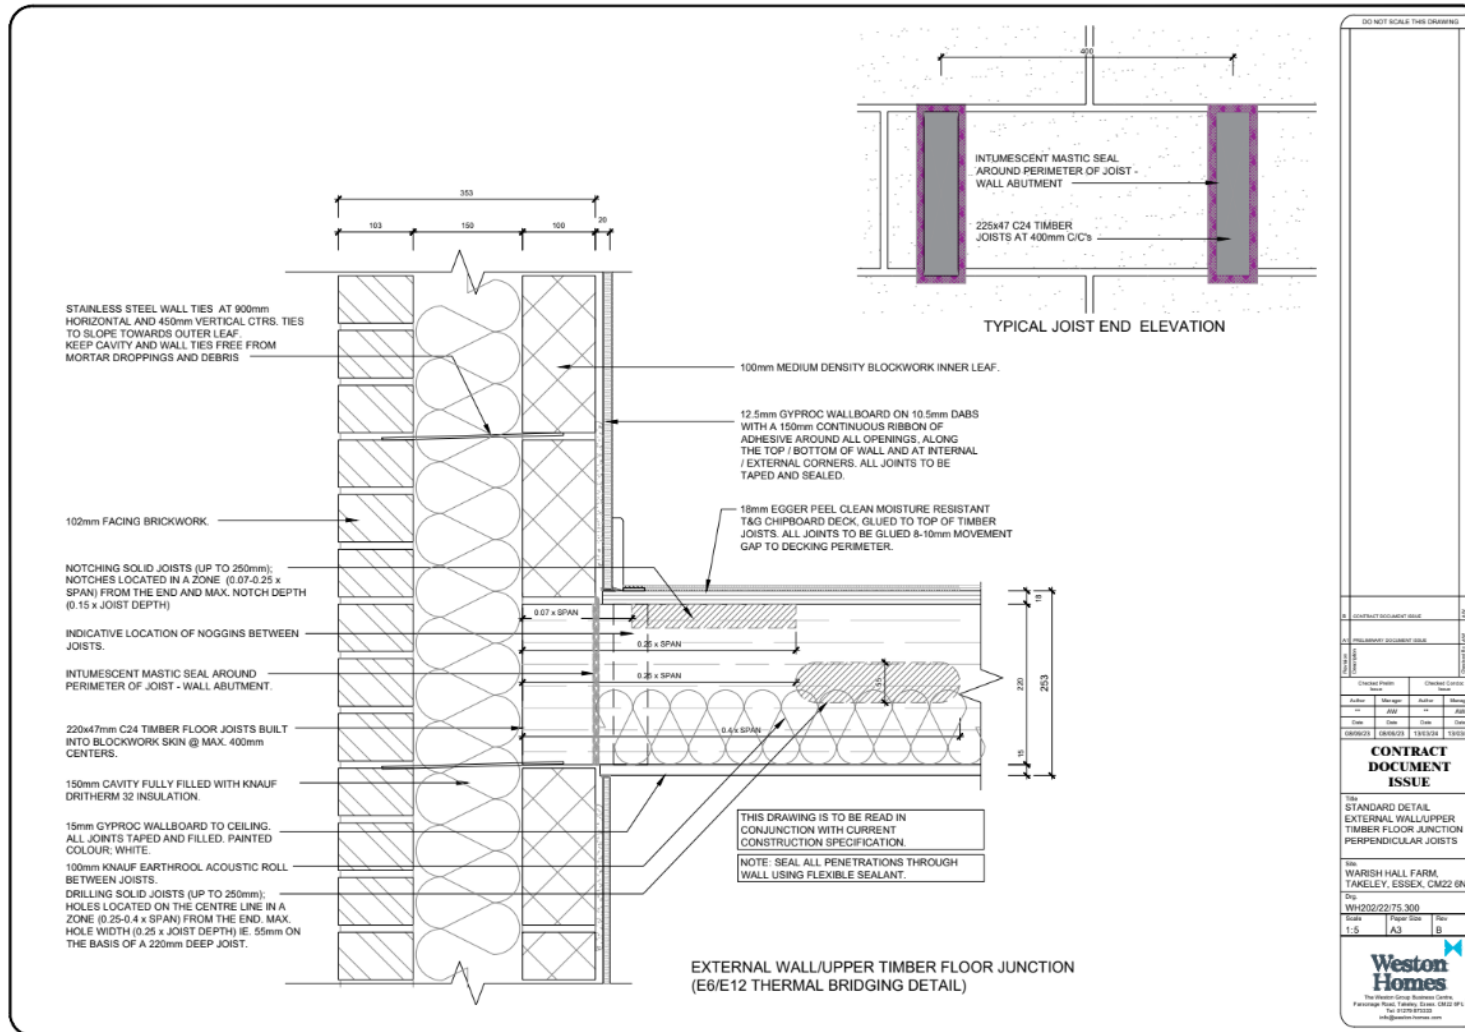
External Wall Construction Drawing WH202/22/75.300 – Jacks Lane
